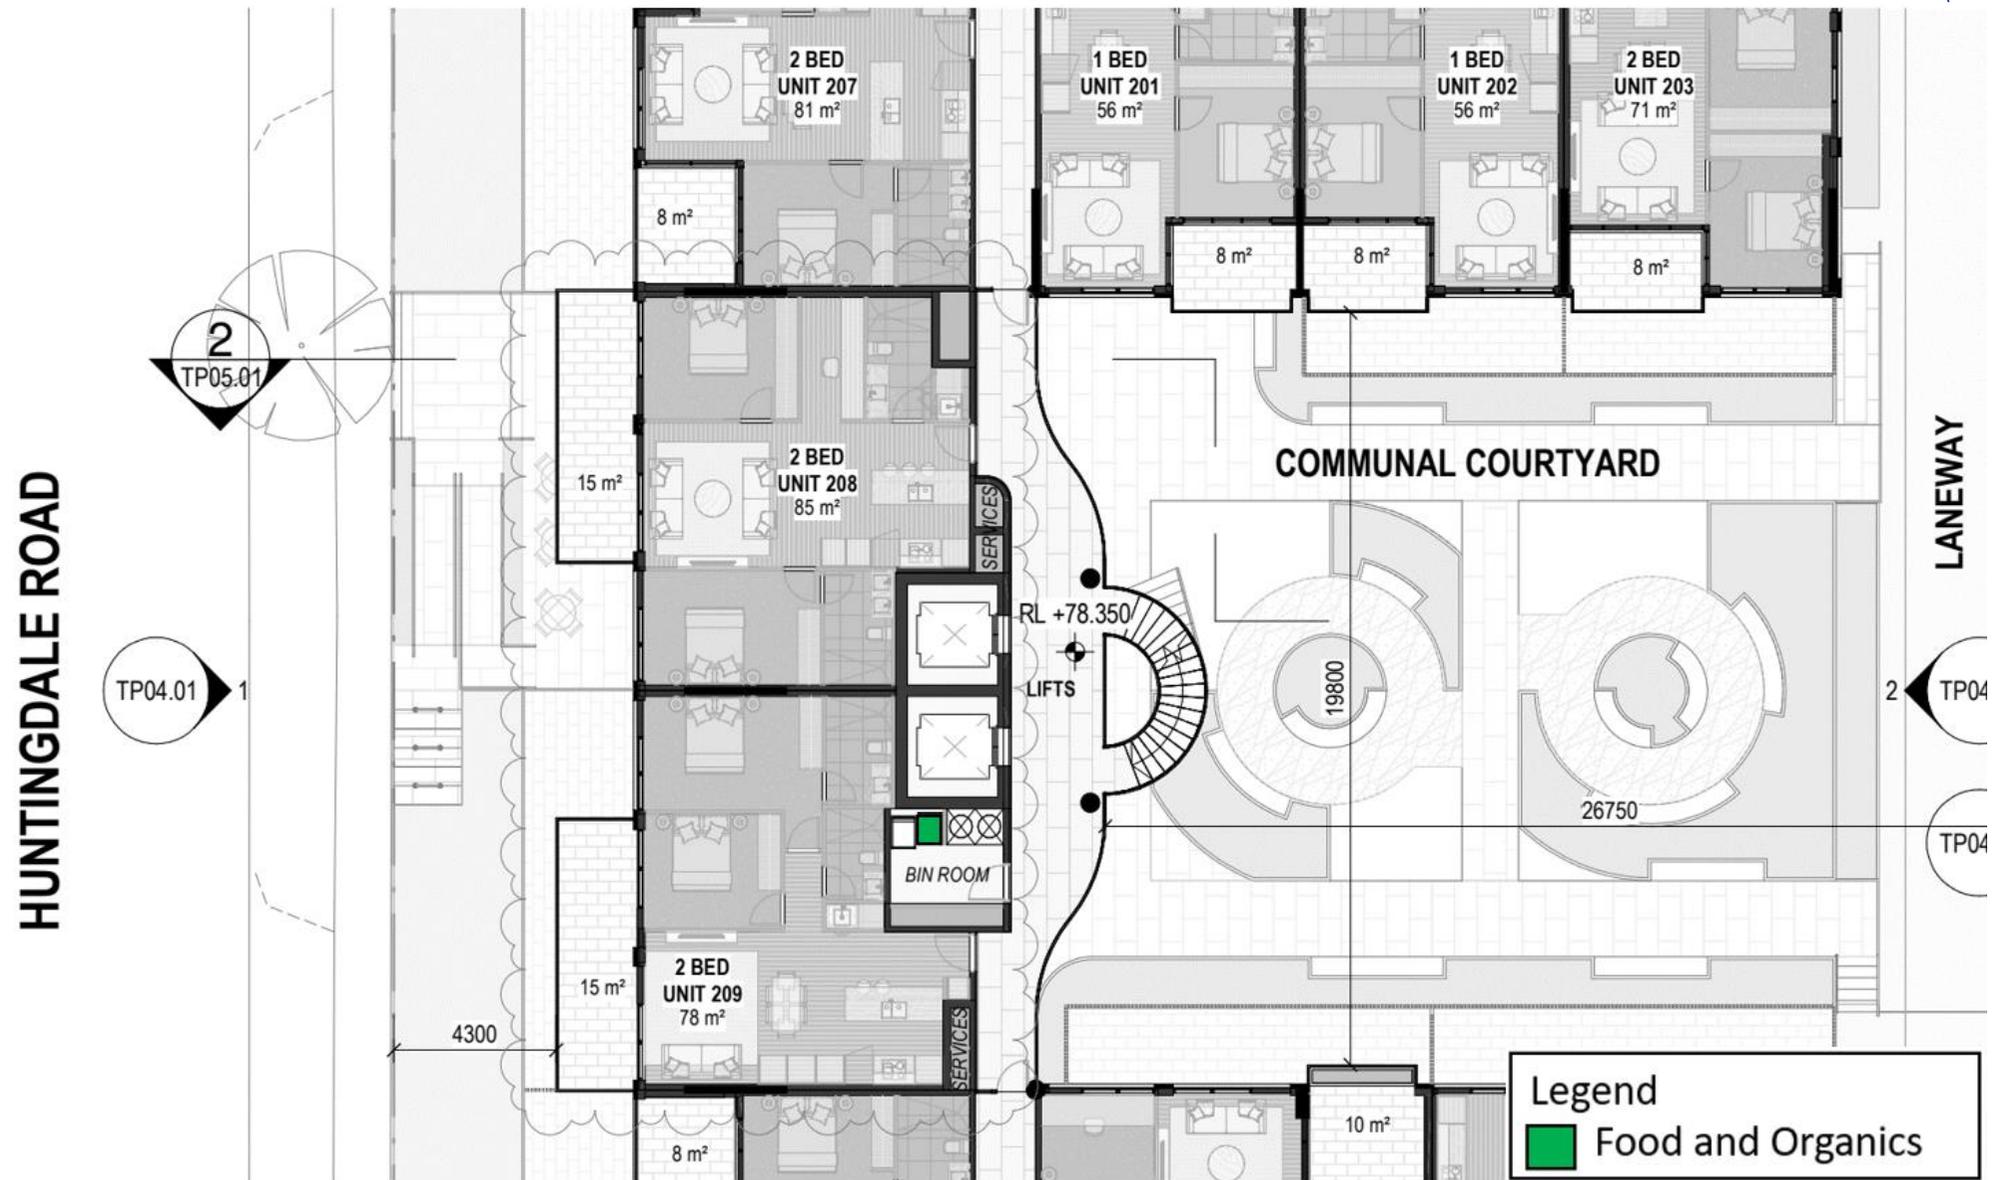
DEVELOPMENT PLAN – SECOND FLOOR BIN STORAGE AREA - CURRENT
